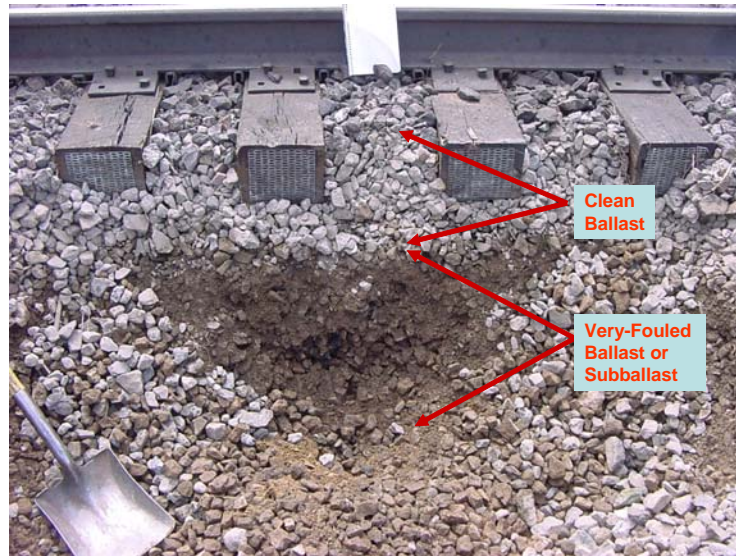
Typical ground truth cross-trench in railroad, showing ballast condition.
